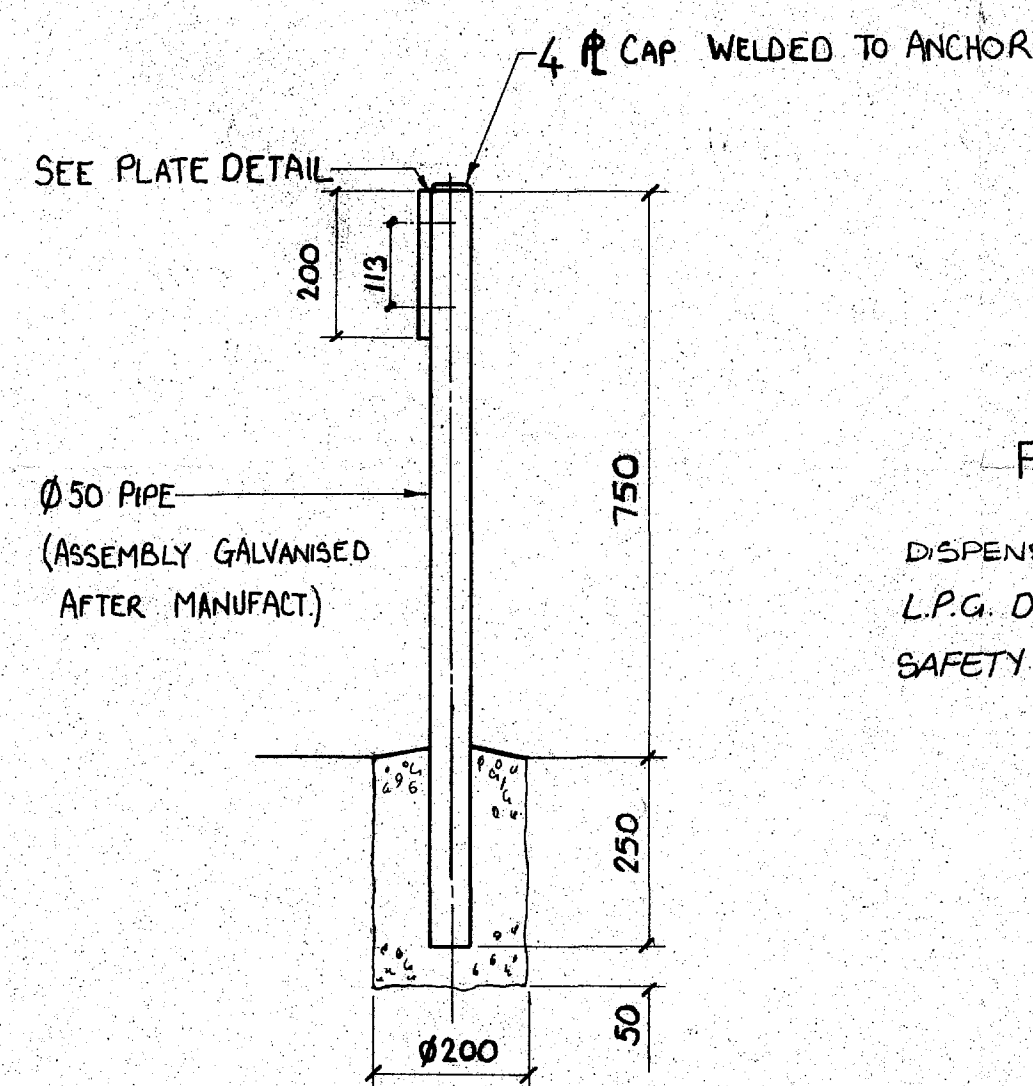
DETAIL 'A' ANCHOR & FILL POINT DETAIL NTS
